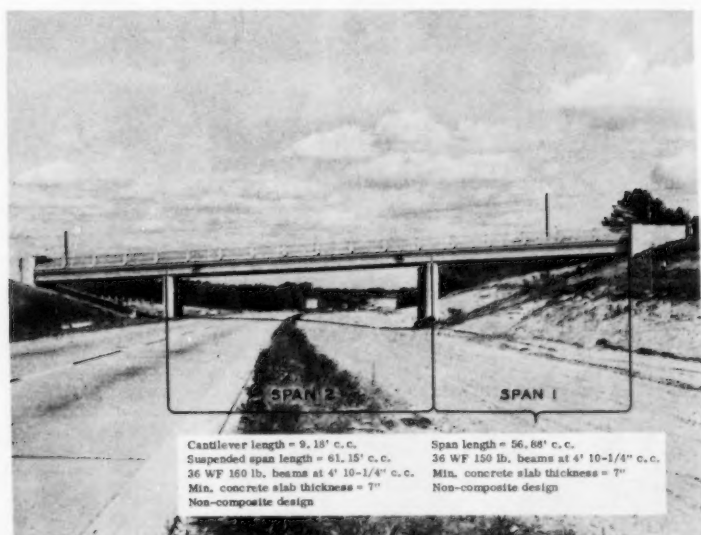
Bridge B1 of 39-5-8. Over route US-12 near Kalamazoo. Rolled beam cantilever-type bridge.
